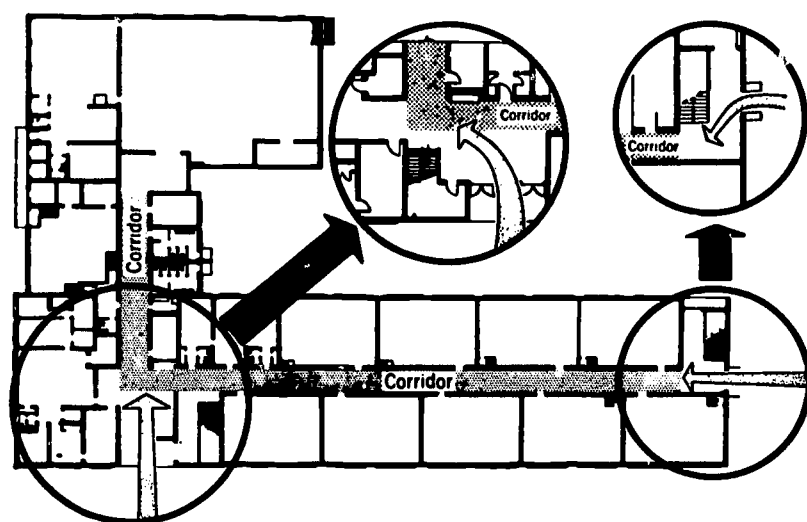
First-floor plan of a typical elementary school shows that corridor areas offer best shelter potential. Their protective value is enhanced by relocation of stairwells and partial baffling of entranceways, shown by arrows.
